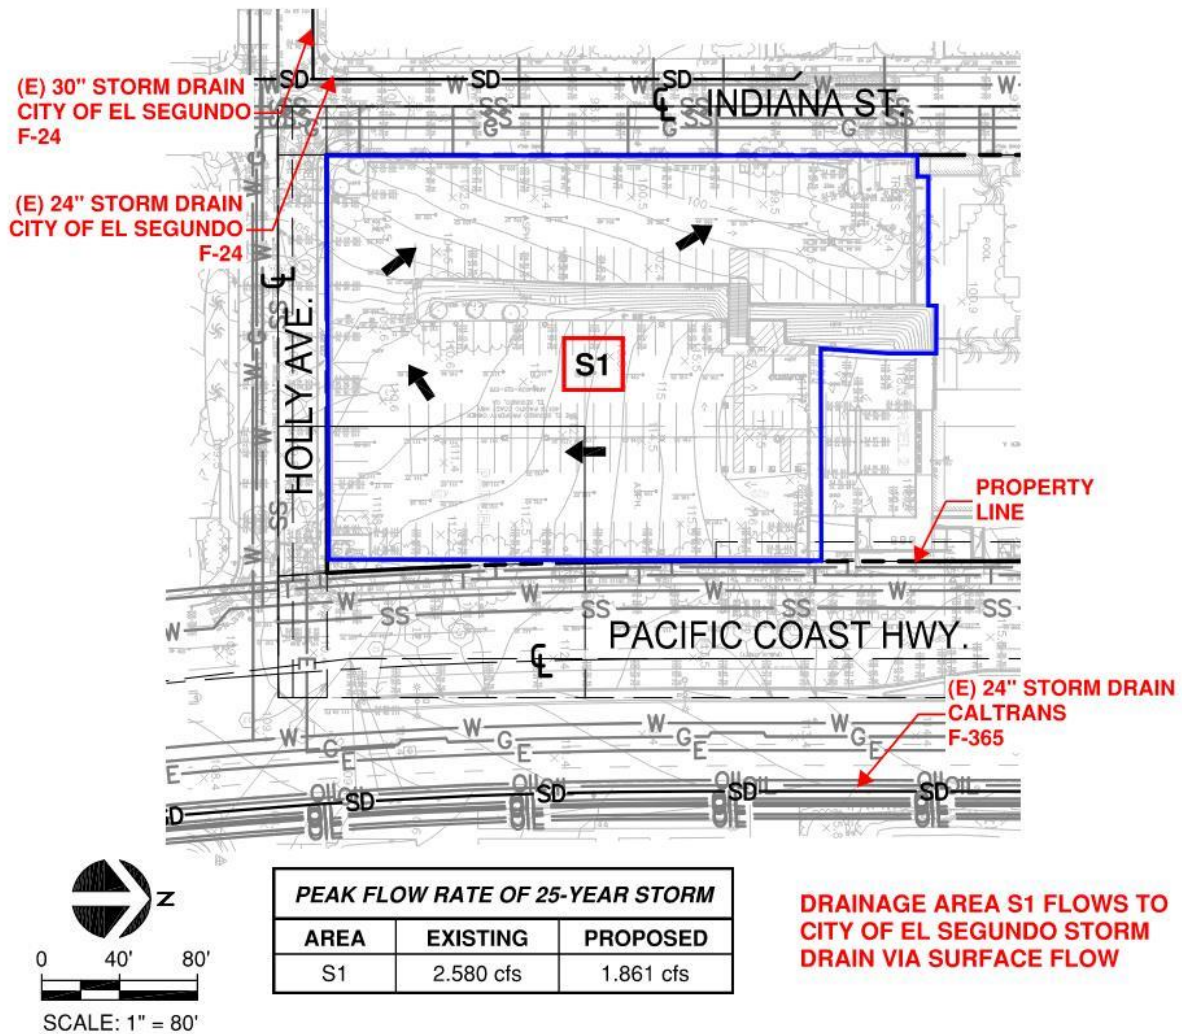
A EXISTING DRAINAGE PLAN SOUTH SITE IN THE PCC MU-1 DISTRICT
